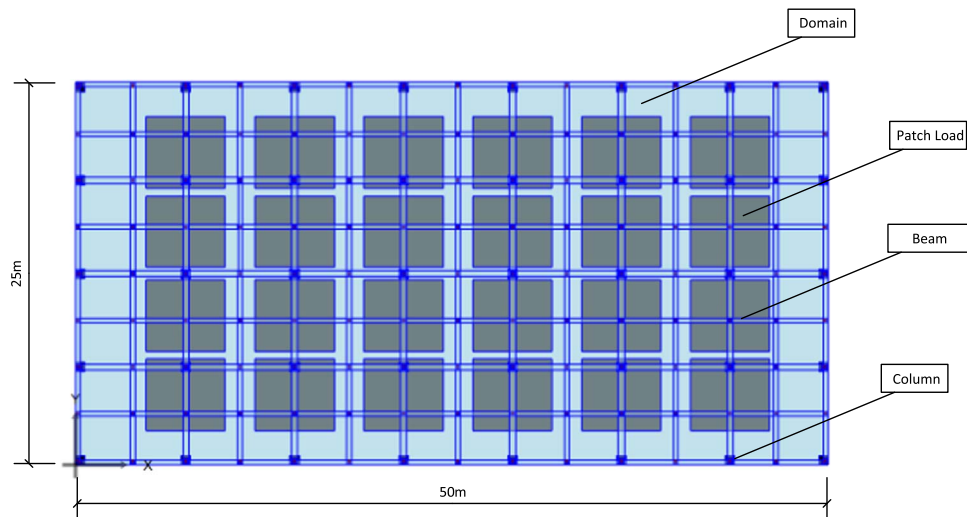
Case 2, Raft foundation on piles with column and wall loads.
